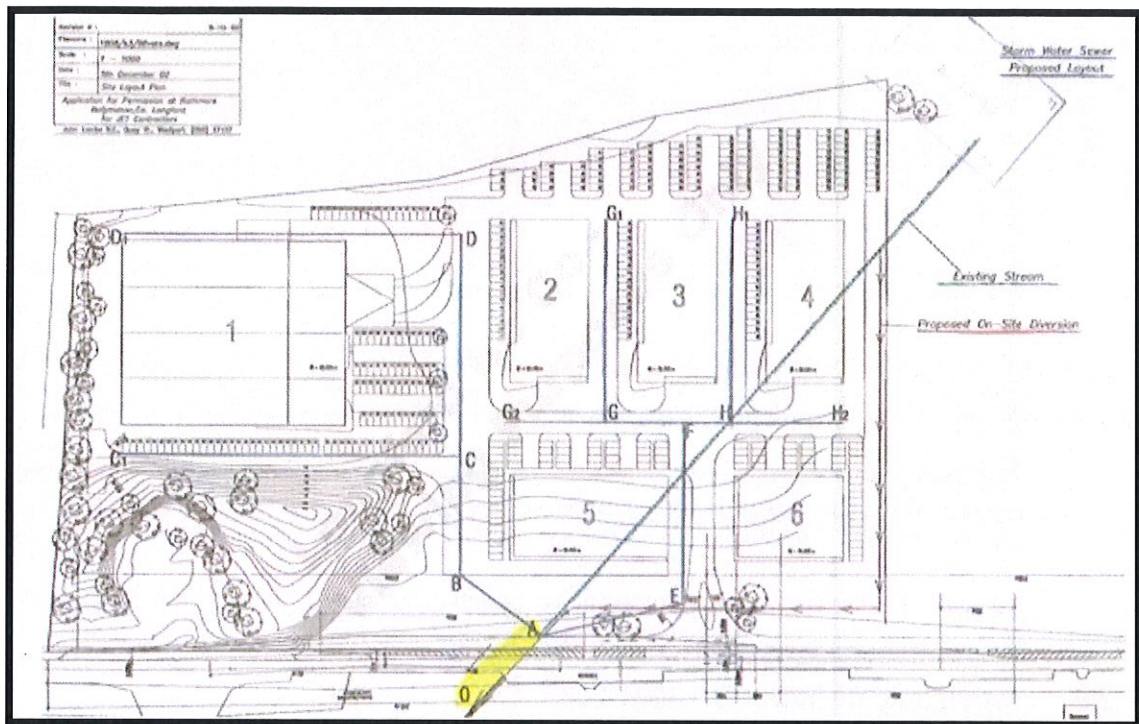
Extract from Site Layout Plan of permitted warehousing/light industrial/office development permitted under Pl. Ref. No. 01/802.
